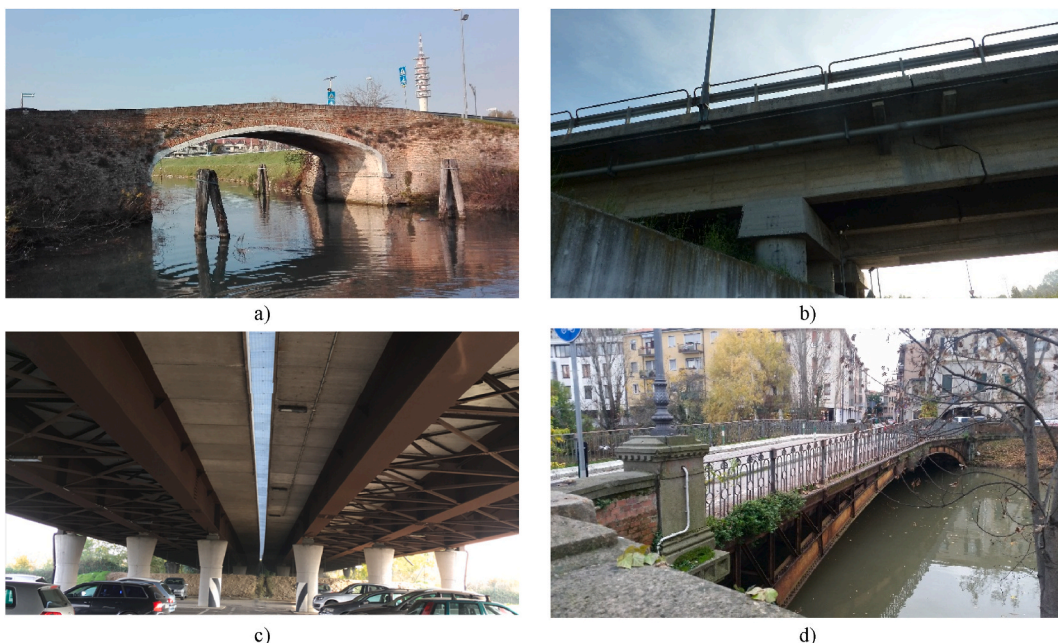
Examples of bridge types in Padova inventory: a) masonry arch; b) r. c. deck with Gerber scheme; c) composed steel-r. c. deck; and d) steel deck arch.
